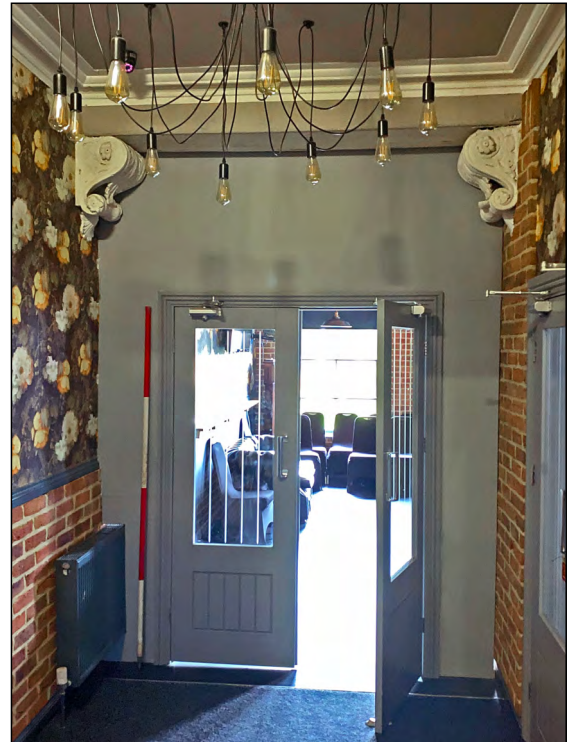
Interior ground floor, view looking NNW along corridor with doorway towards the NW corner of The Rabbit.
